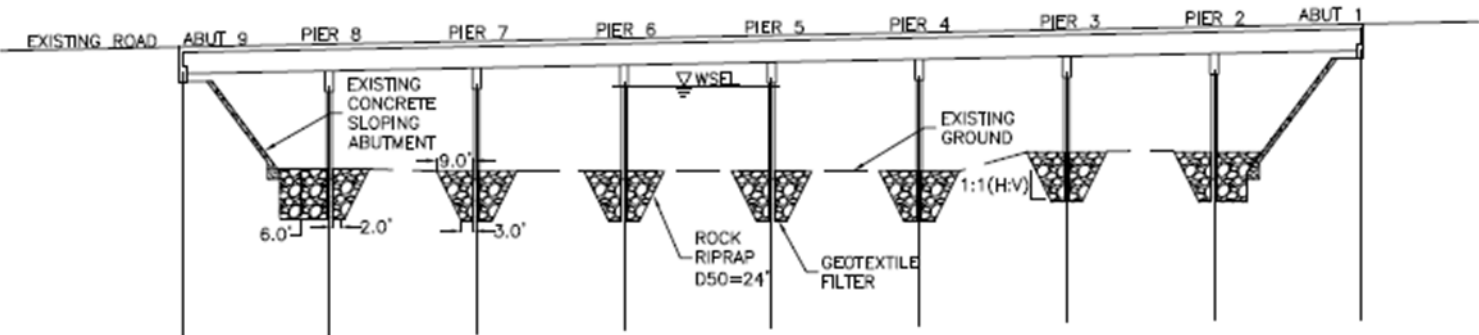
Cross-sectional view of Bridge A-28-P with recommended hydraulic scour countermeasures
